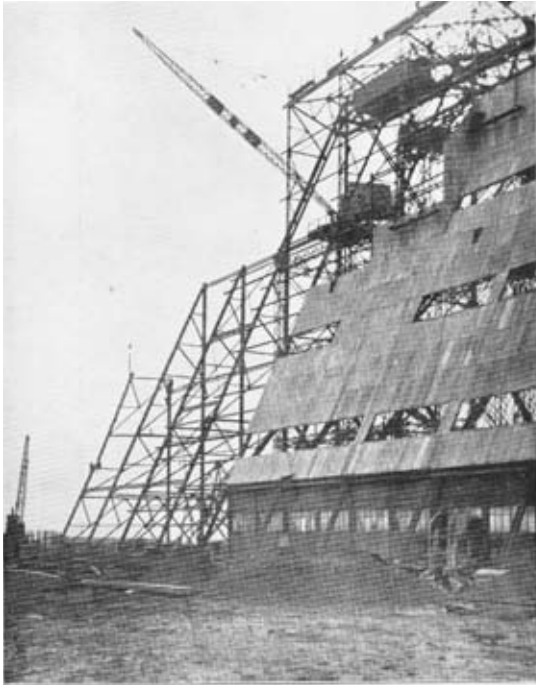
Shed, showing new "A" Frames to extension in course of erection.
